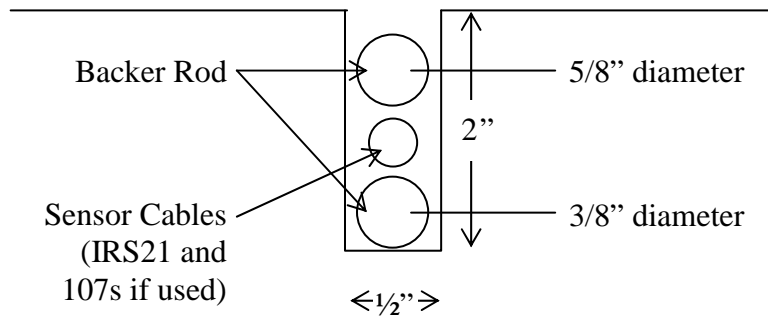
Backer rod is used as a dam to control the epoxy.
